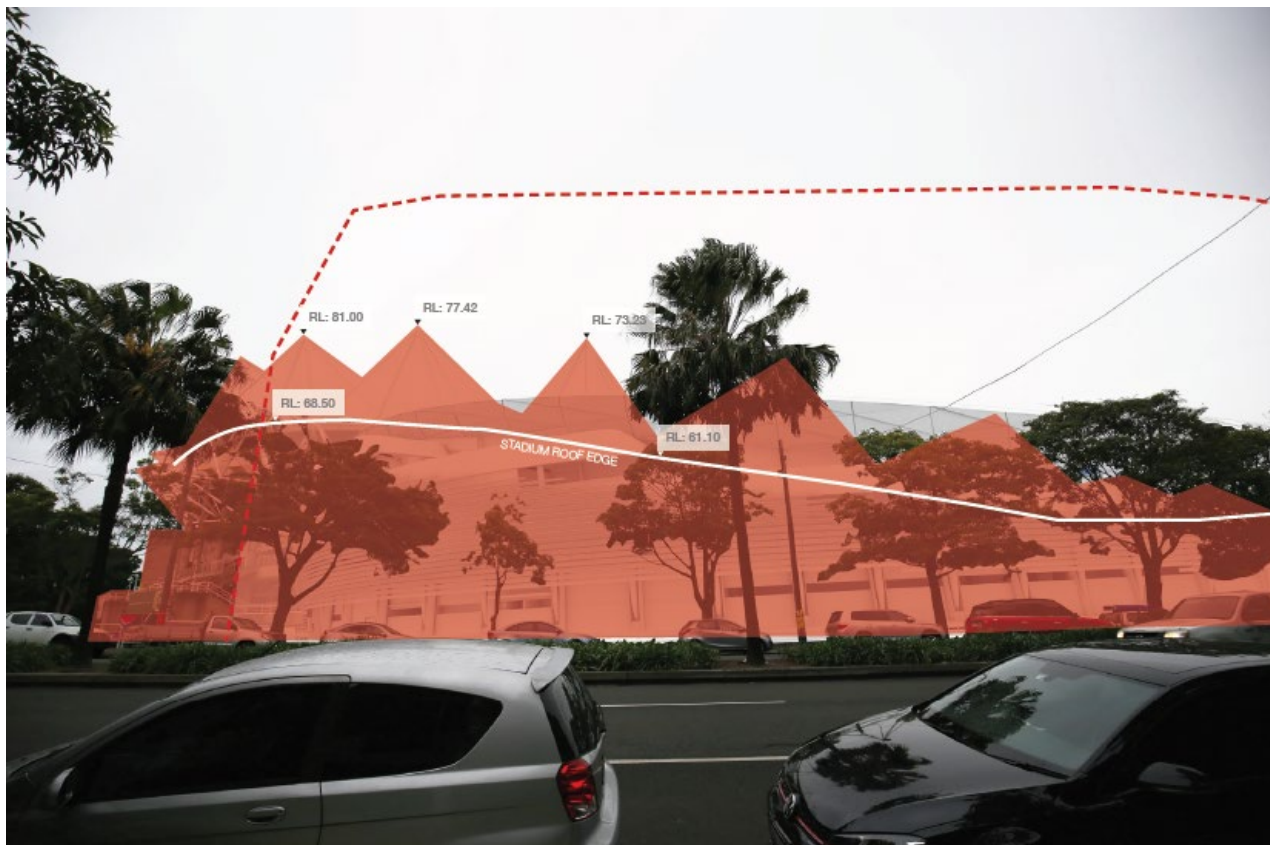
View location 18: Footpath in front of 254-262 Moore Park Road, concept envelope view
